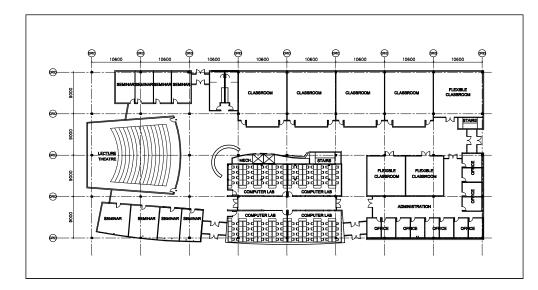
Building plans illustrating the flexibility of a 10.6 m x 9 m grid
